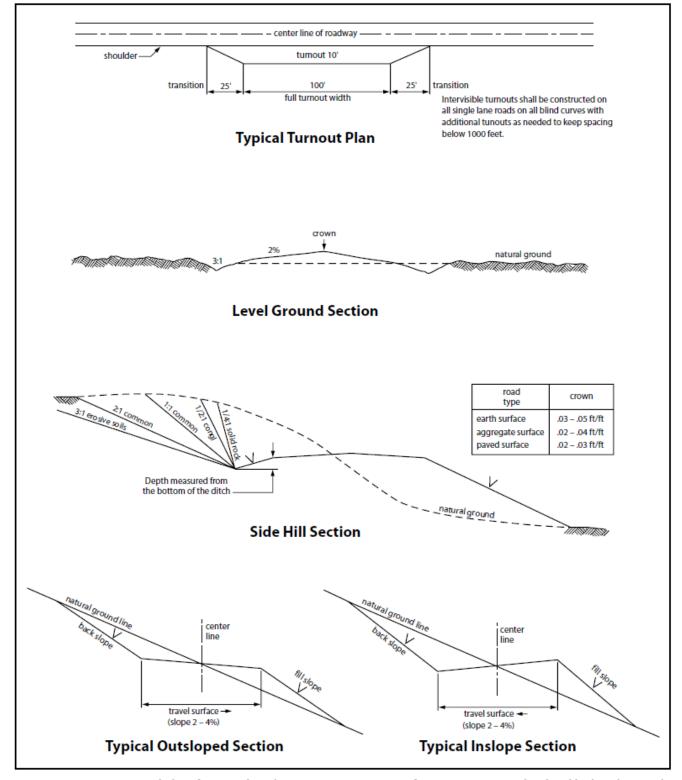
Cross-sections and plans for typical road sections representative of BLM resource or FS local and higher-class roads.
